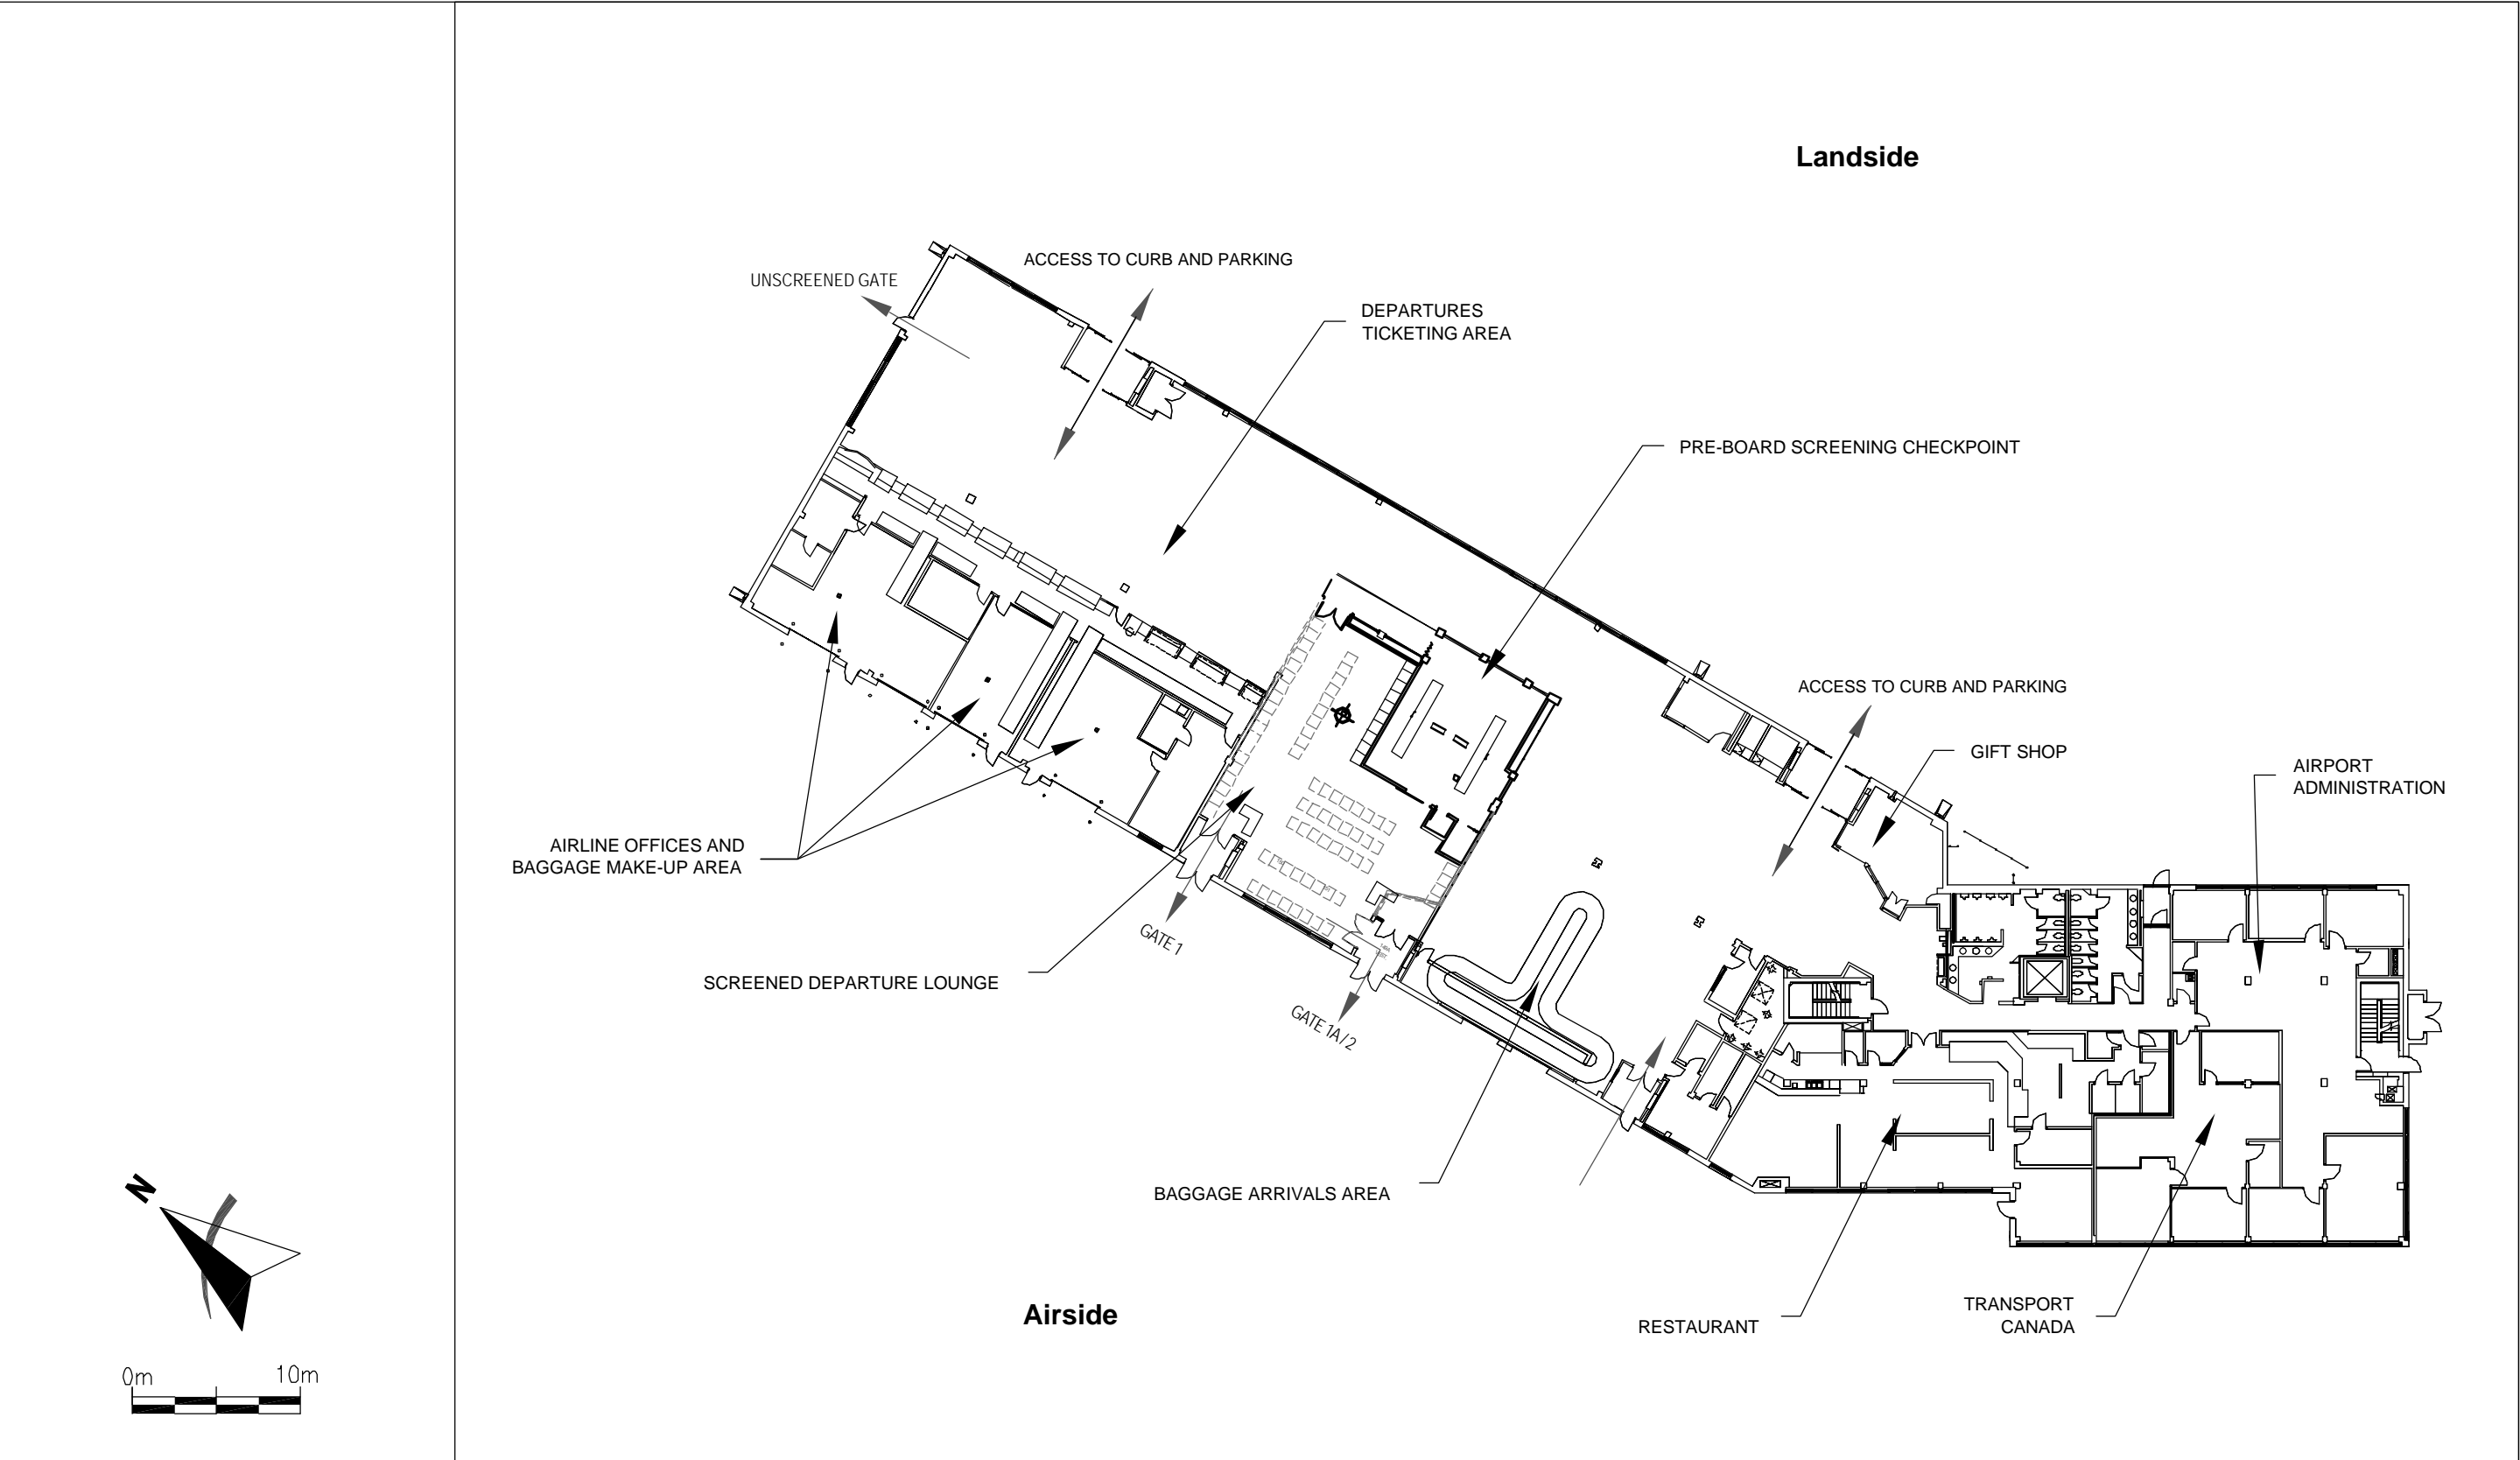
Existing Passenger Terminal Building Layout - Ground Floor
